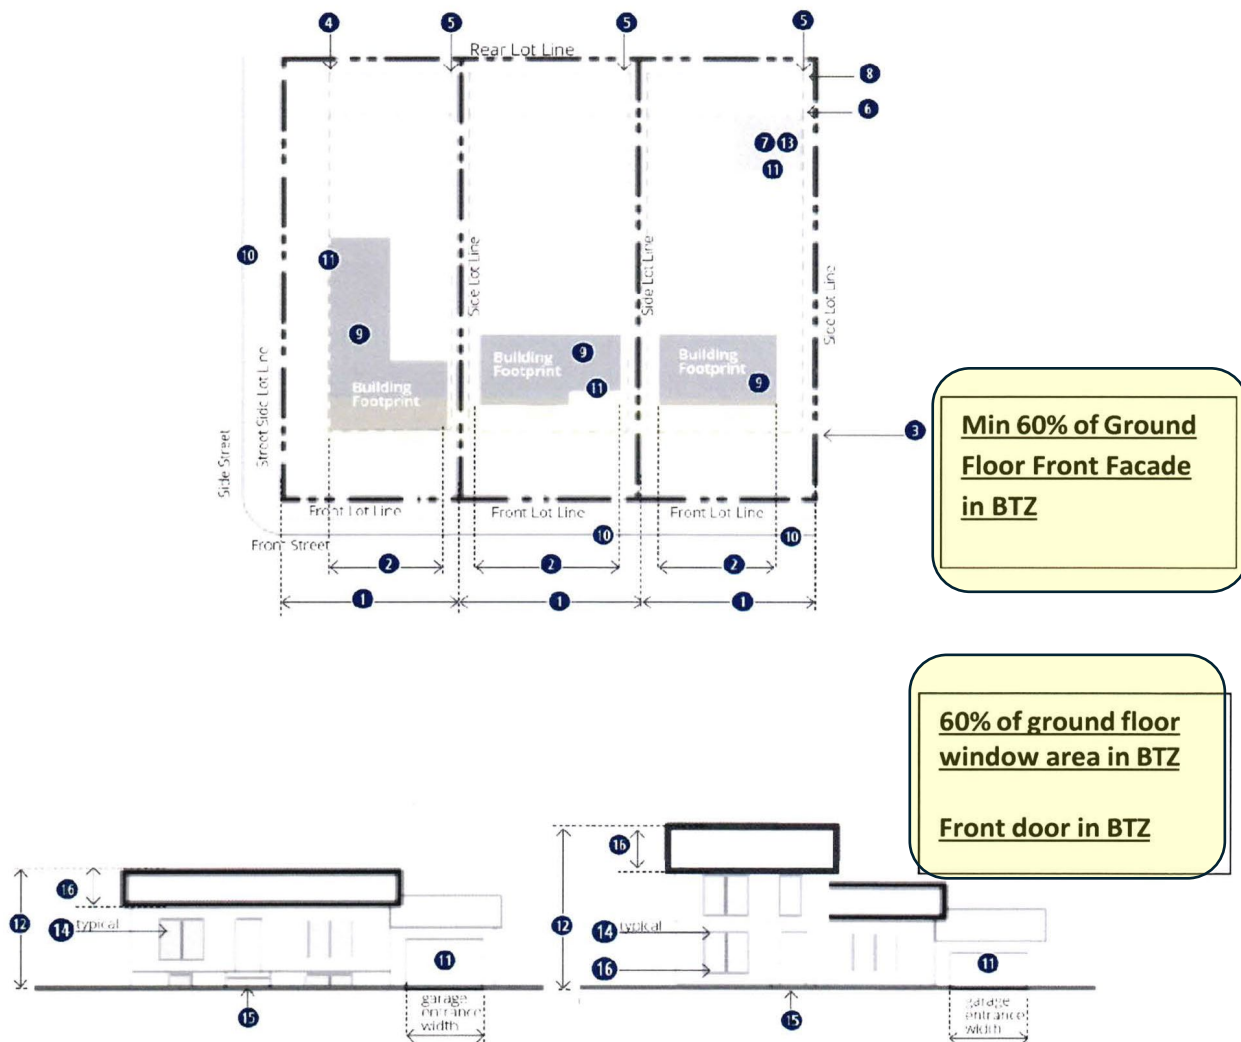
(6). N2 district diagrammatic plans and elevations.
